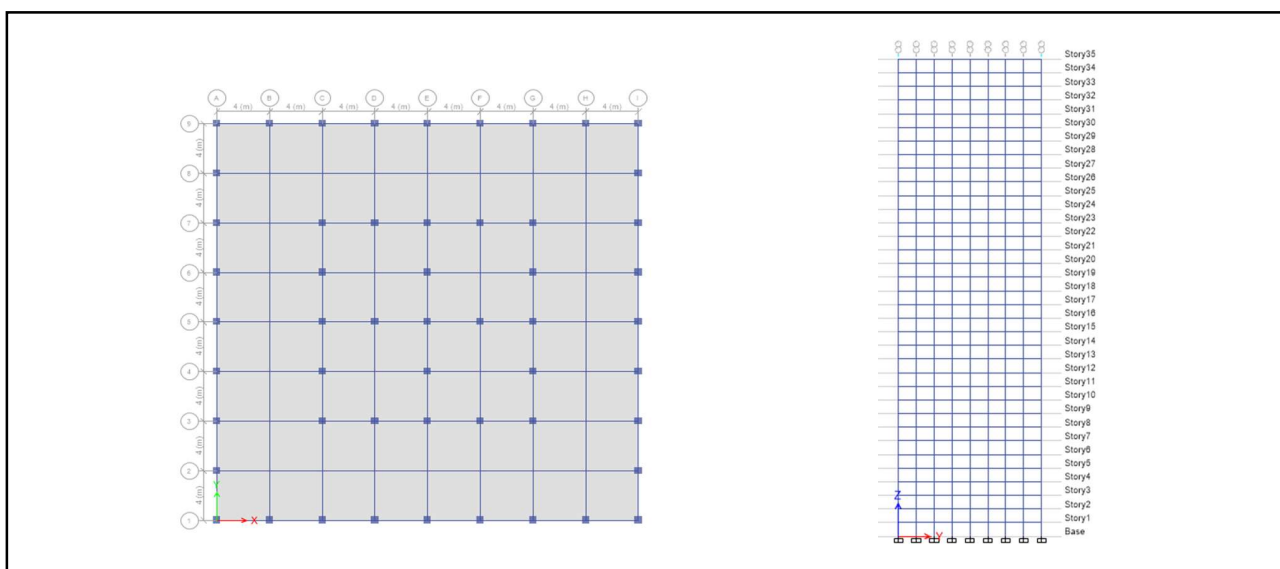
Plan and elevation of Moment resisting frame with floating columns
